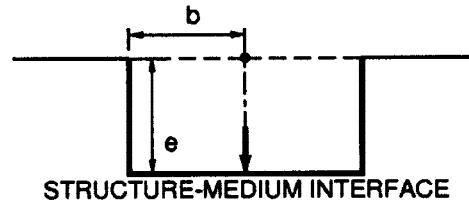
Strip foundation with rectangular cross section embedded in transversely isotropic half-plane
